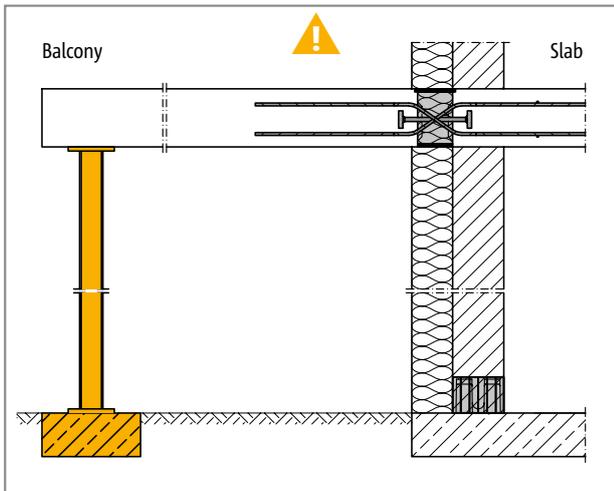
Schöck Isokorb® XT type Q-P-VV: Continuous support required
